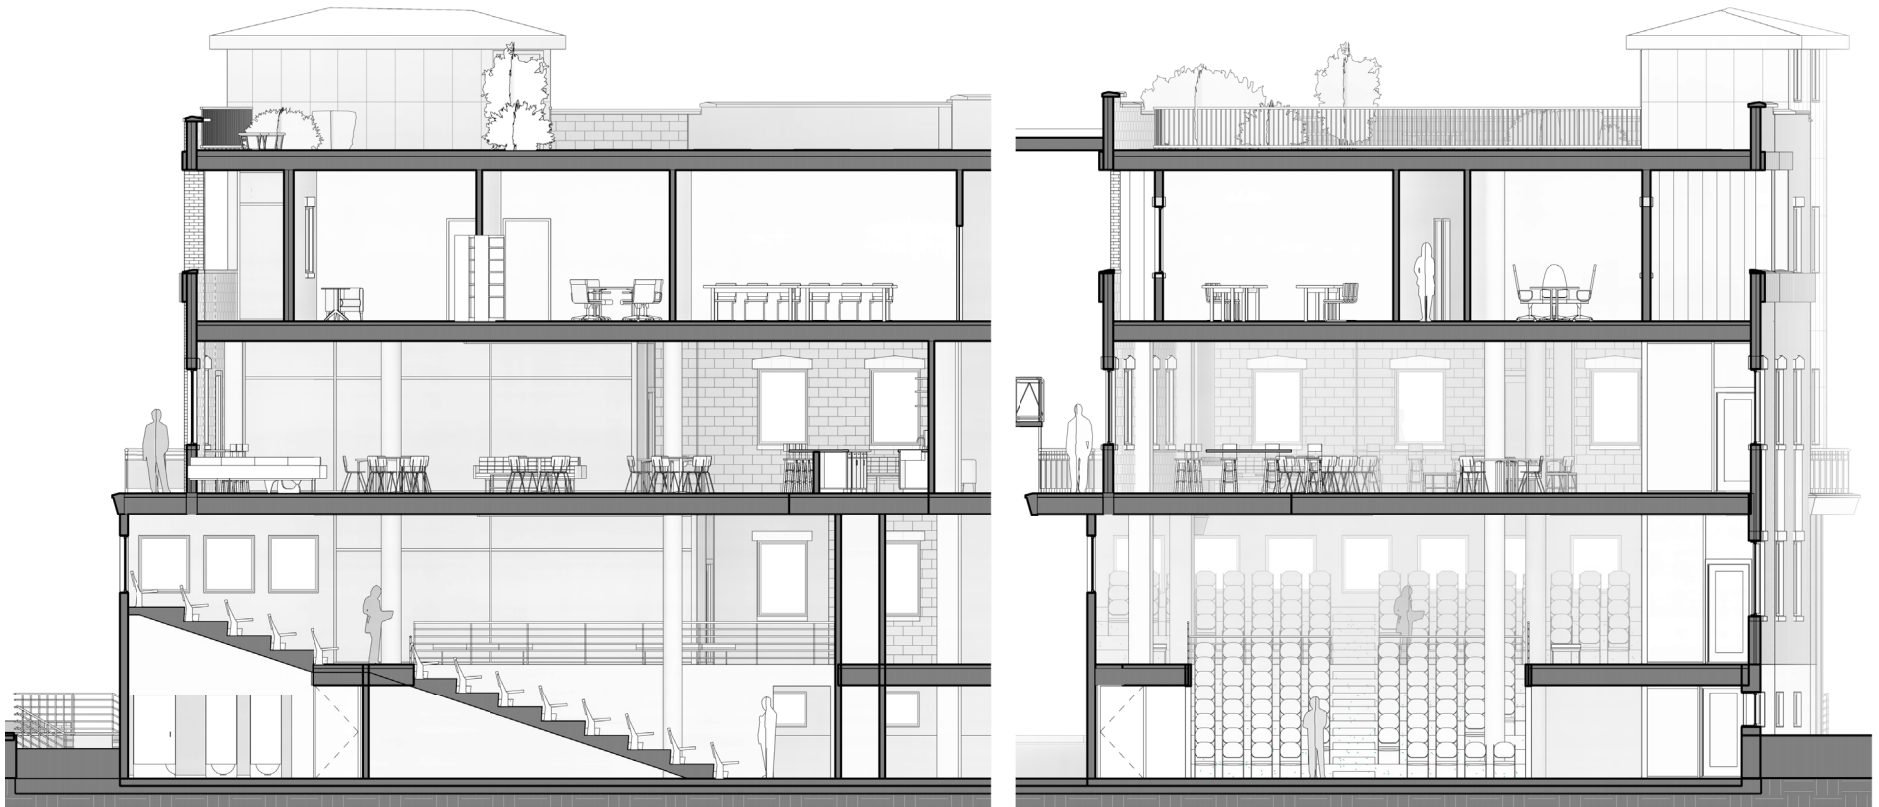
shows section cuts through the lecture hall, cafe, office spaces, and roof garden.
